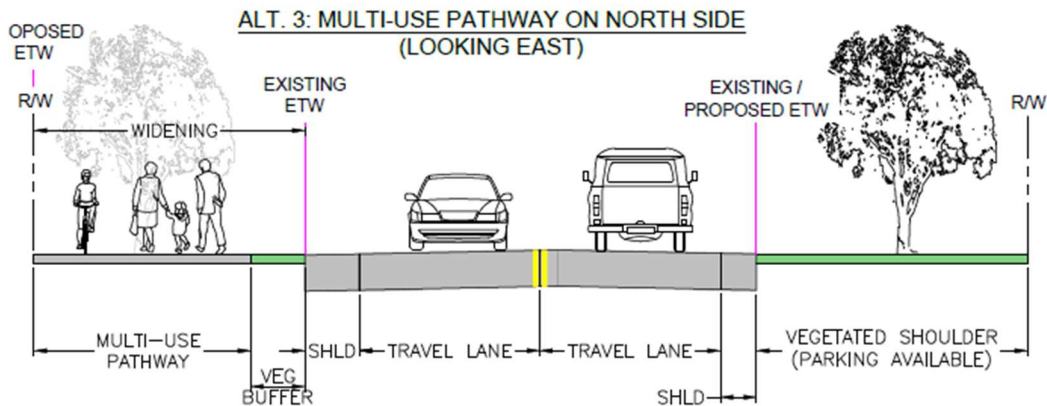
Coleman Avenue (Menlo Oaks) Alternative 3
